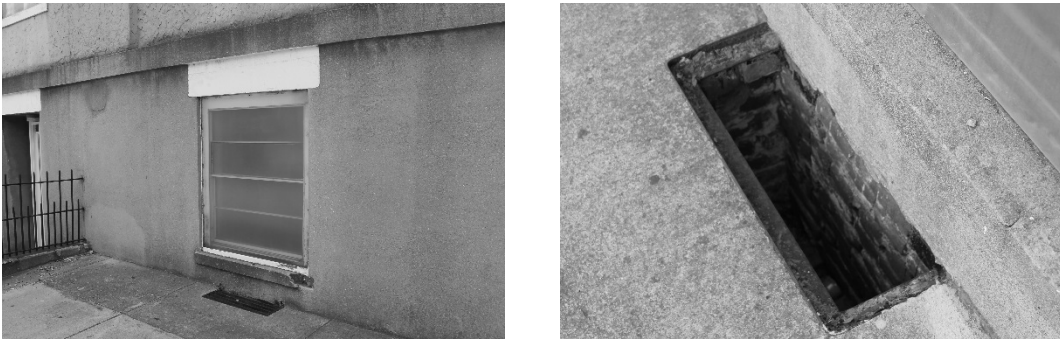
Brick foundation detail below sidewalk of the First African Baptist Church (Photograph by the author)
